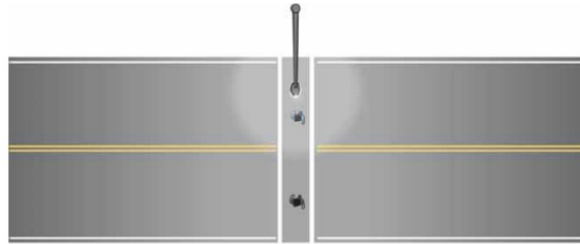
Drawing. Traditional midblock crosswalk lighting layout.
